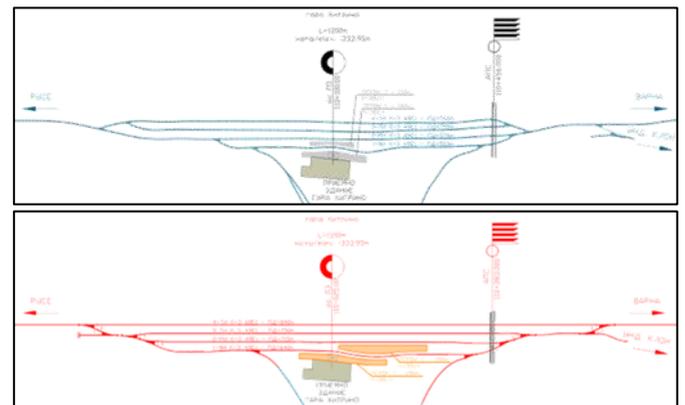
Schematic view of Hitrino station – Existing and proposed layout
